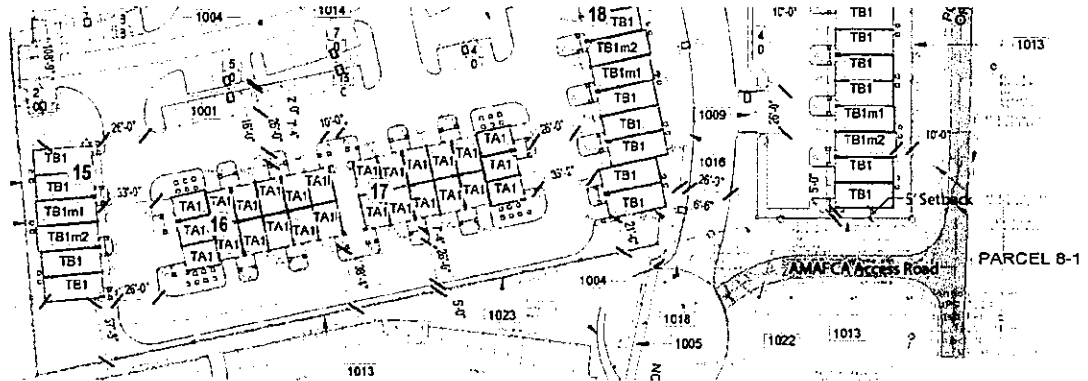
Proposed 5-foot setback at the southeast corner of the site with future AMAFCA Access Road highlighted in green.
